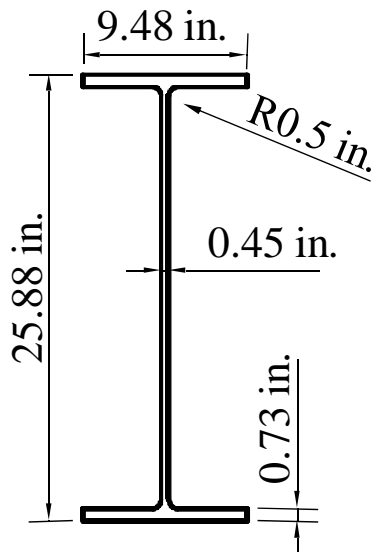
Cross-section dimensions of W26x85 bridge girder
